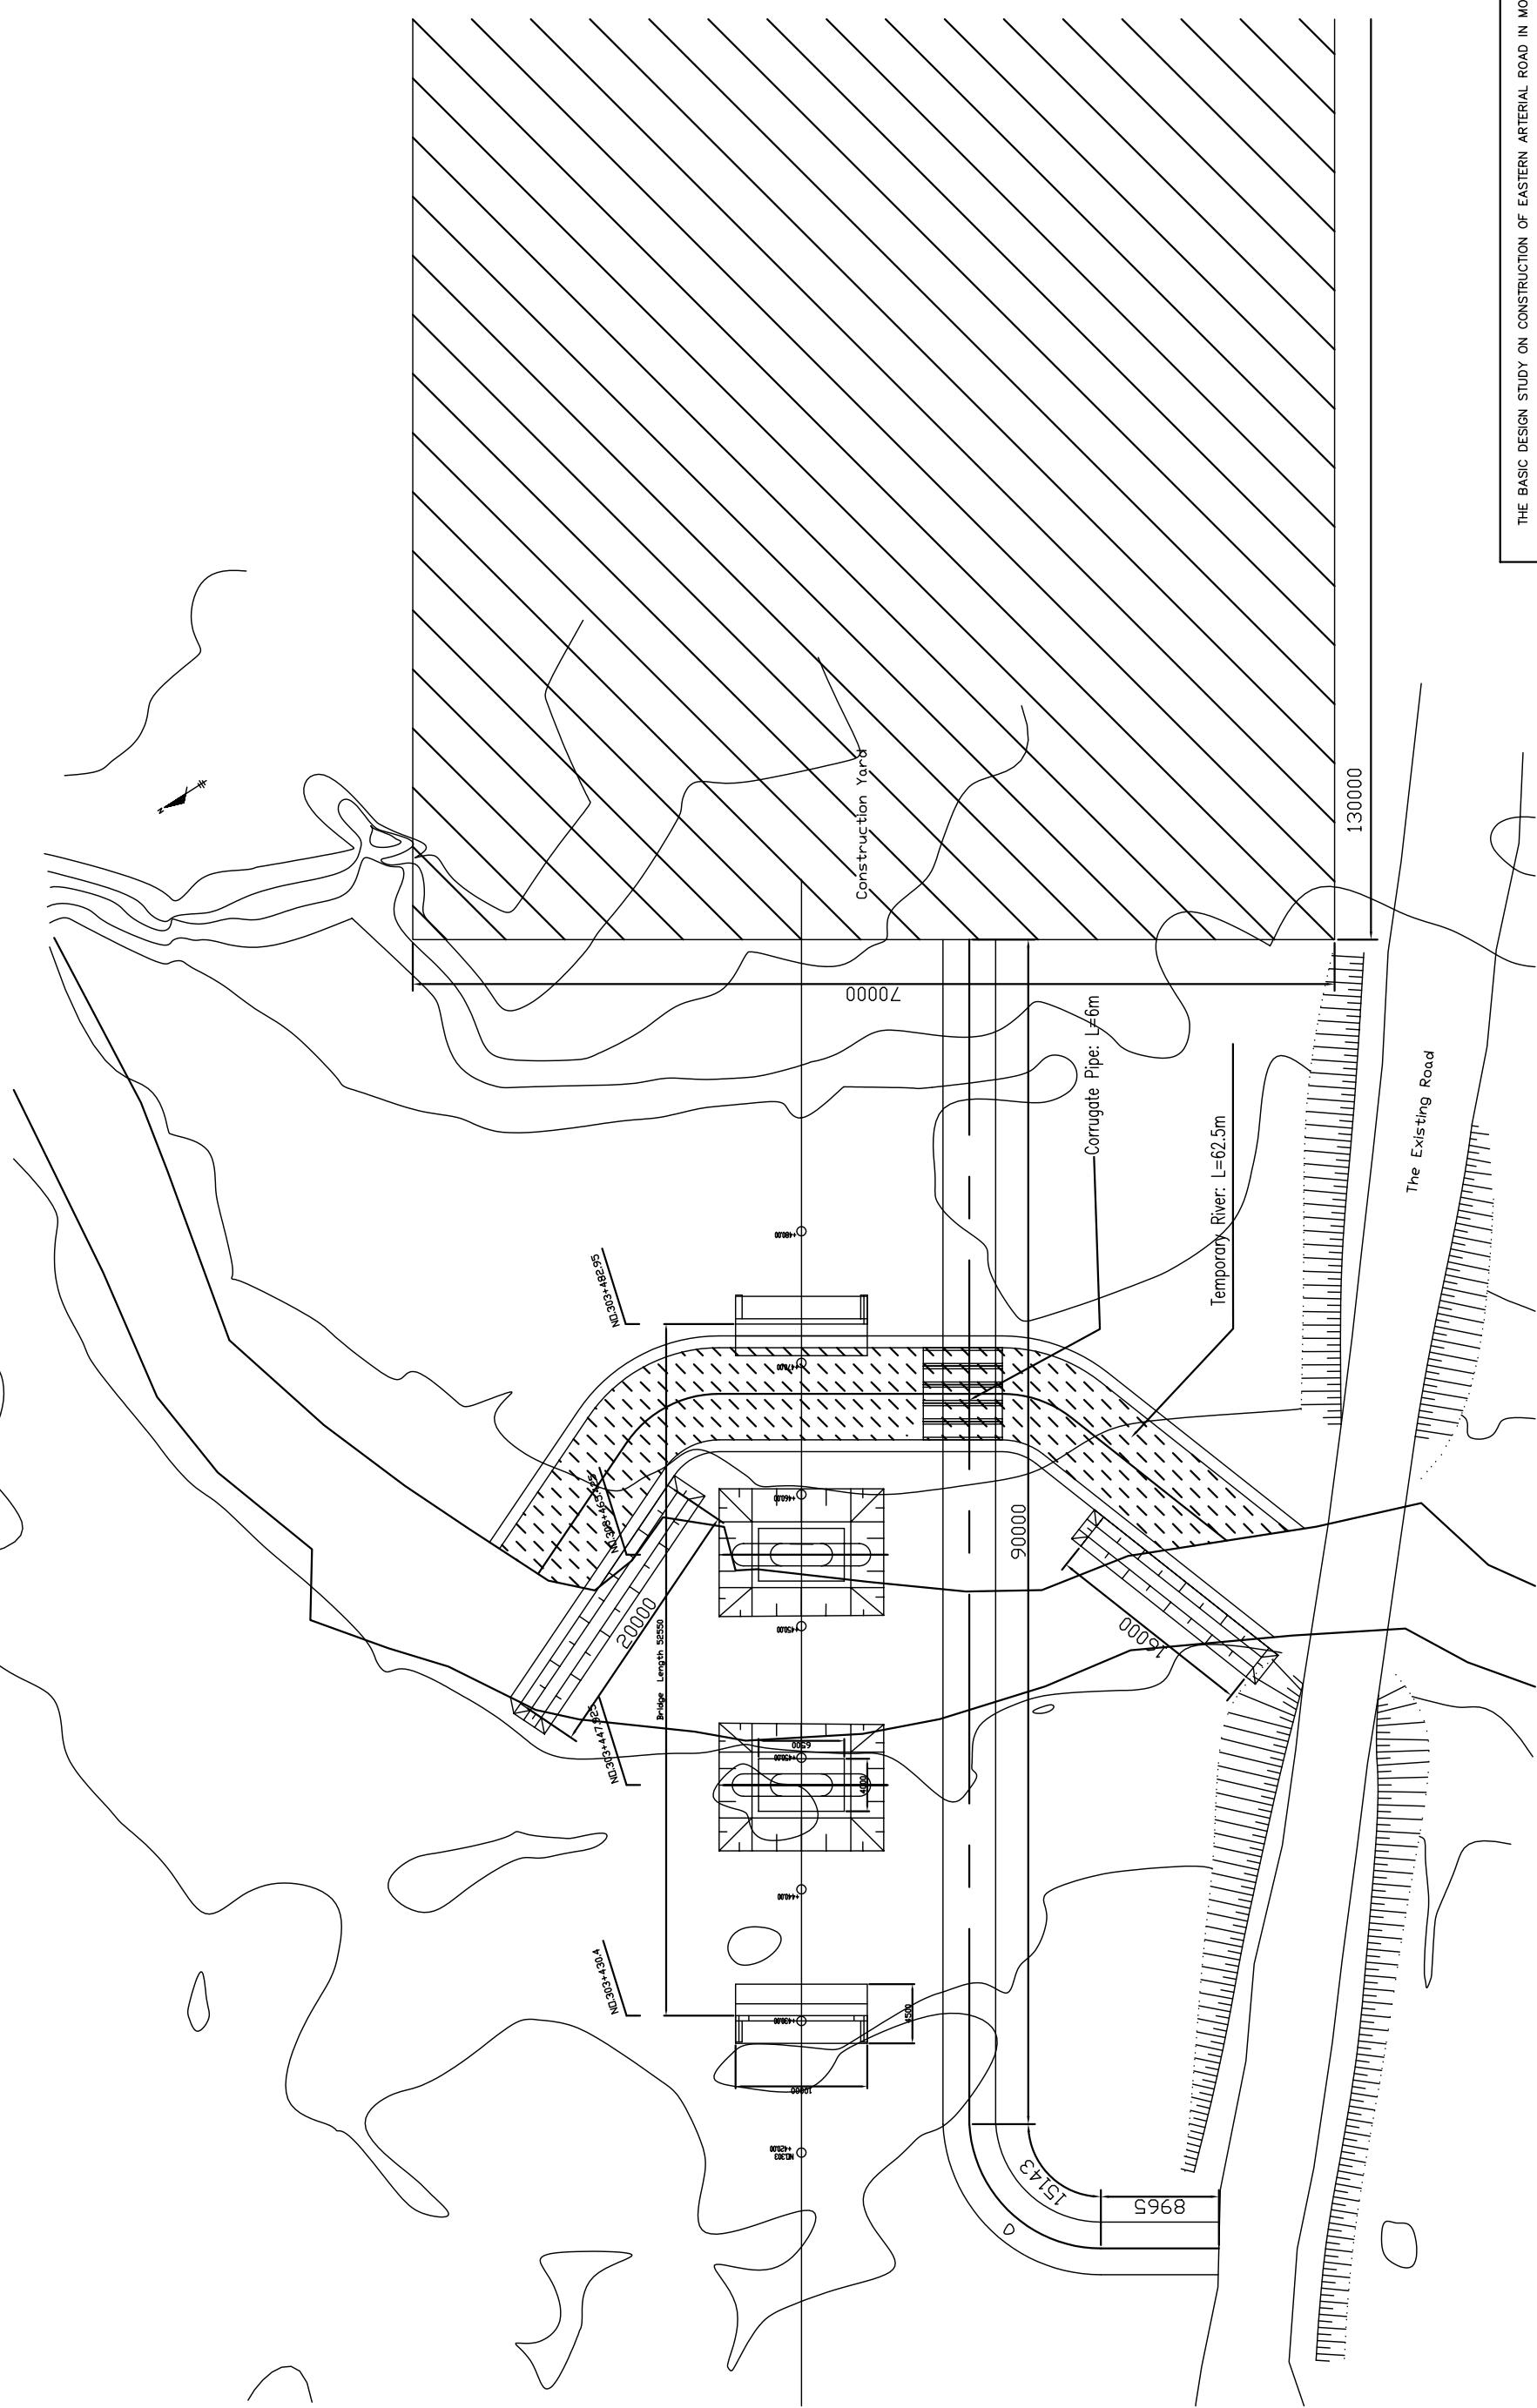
Construction Plan of Murun Bridge(1)
